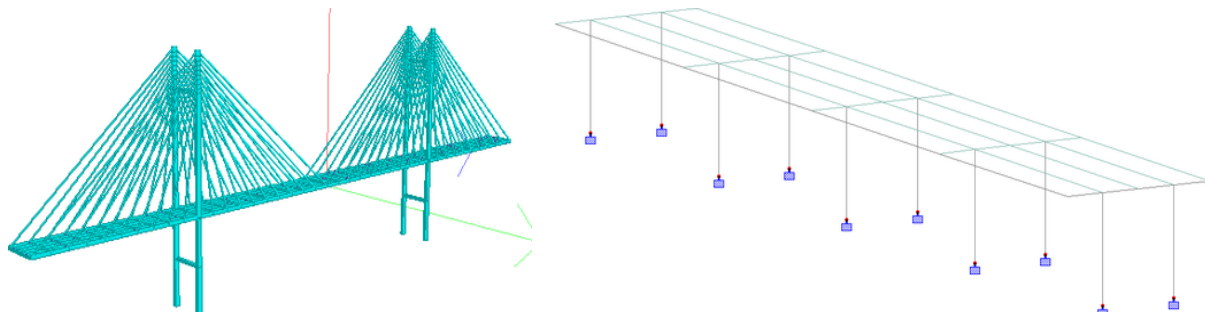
(a) STAAD.Pro structural overview model; (b) Pinned support conditions assigned at abutment bearing nodes [Source: STAAD.Pro model]
